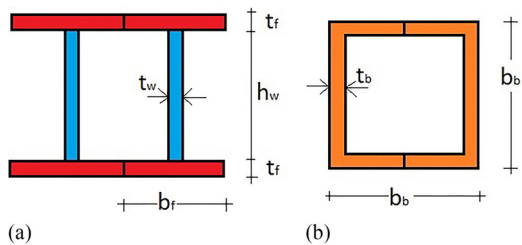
Configuration of the beam and X-brace sections: (a) beam; (b) brace
